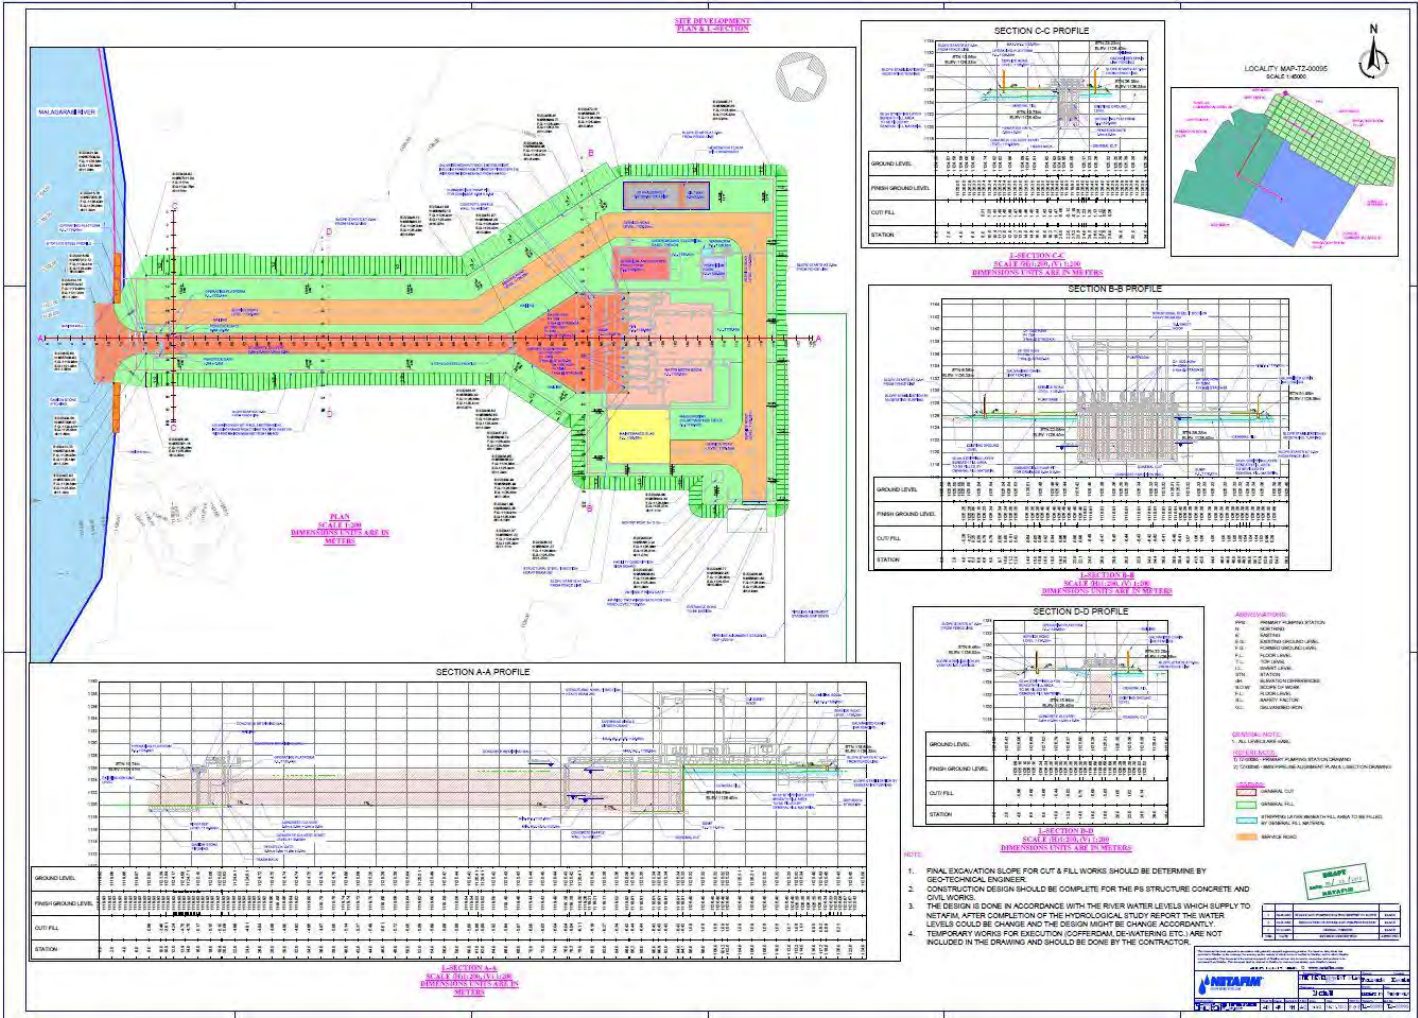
INTAKE 2 SITE DEVELOPMENT PLAN
